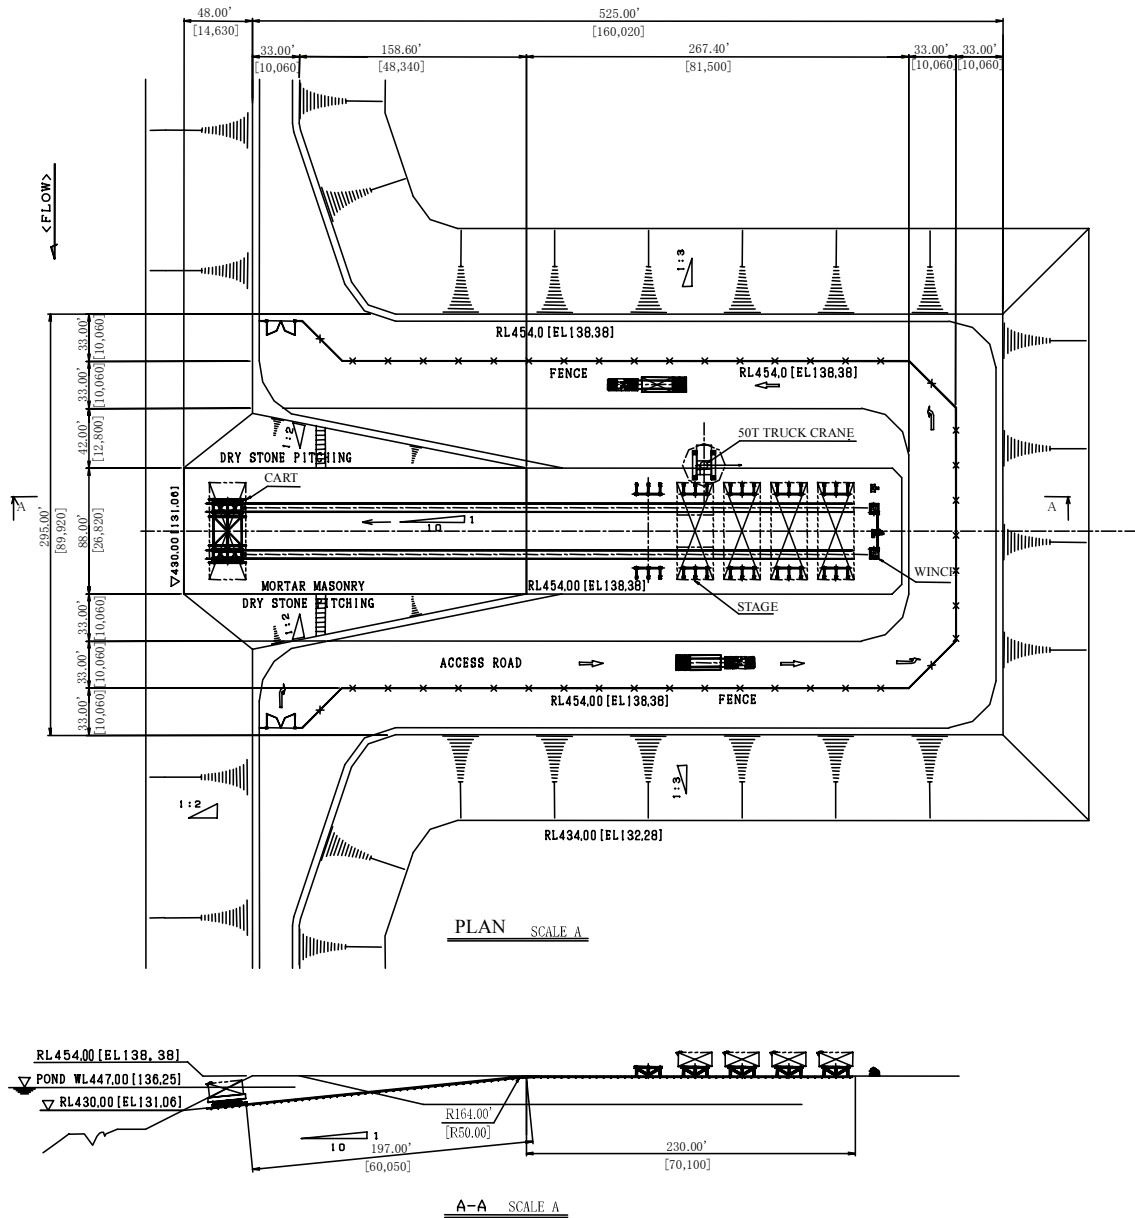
Layout of Bulkhead Gate Stockyard
